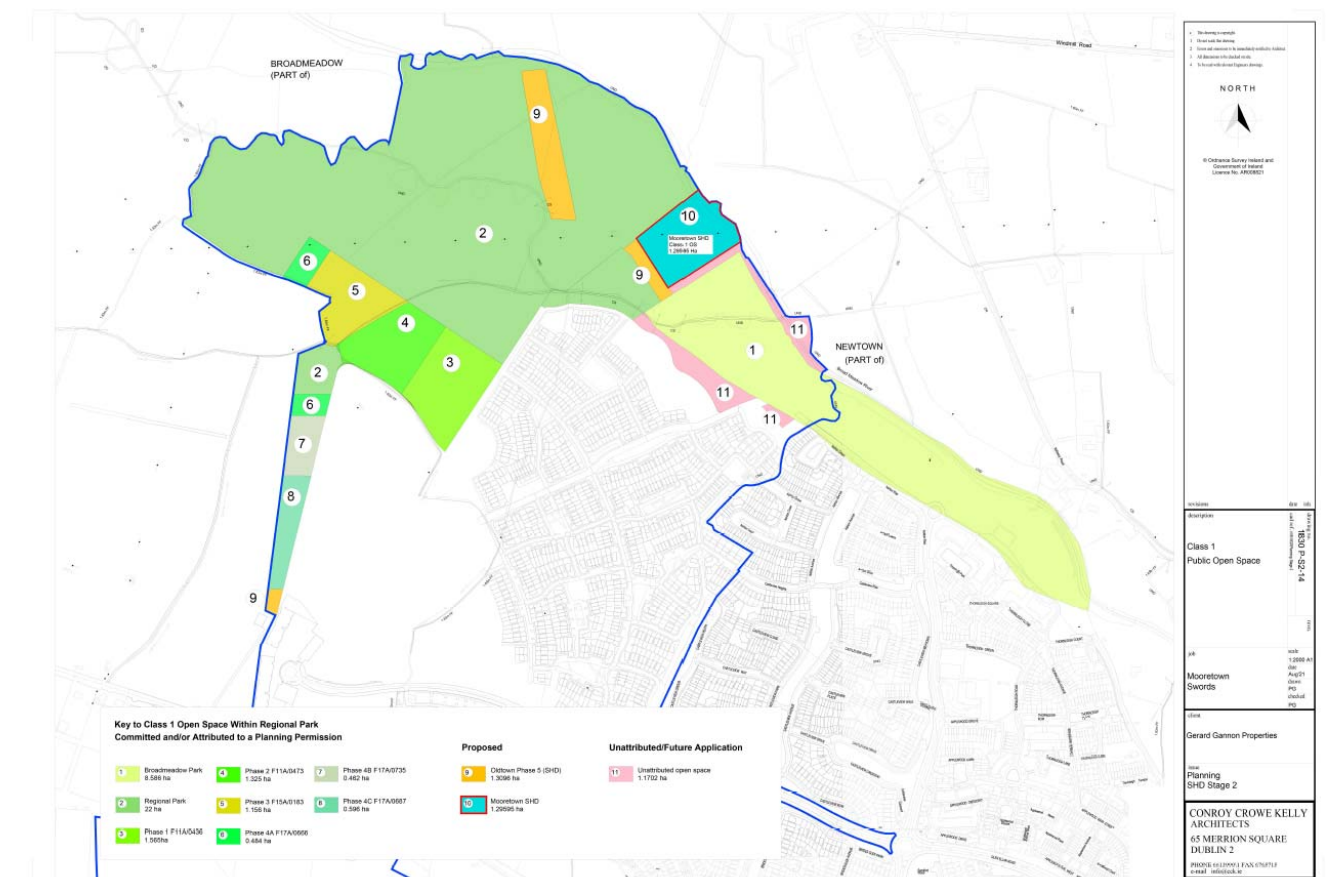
Class 1 extract – drawing no. 1836-SHD-S-134 (CCK Architects) refers.
